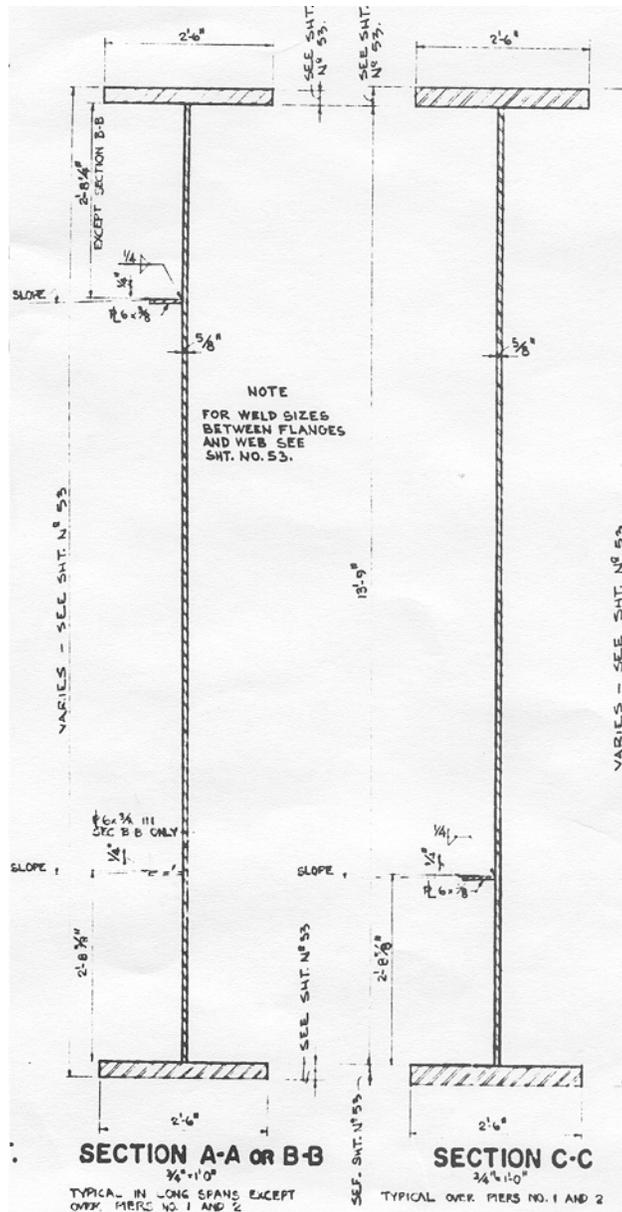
Transverse stiffener web gap – girders (Bridge # 9330)
